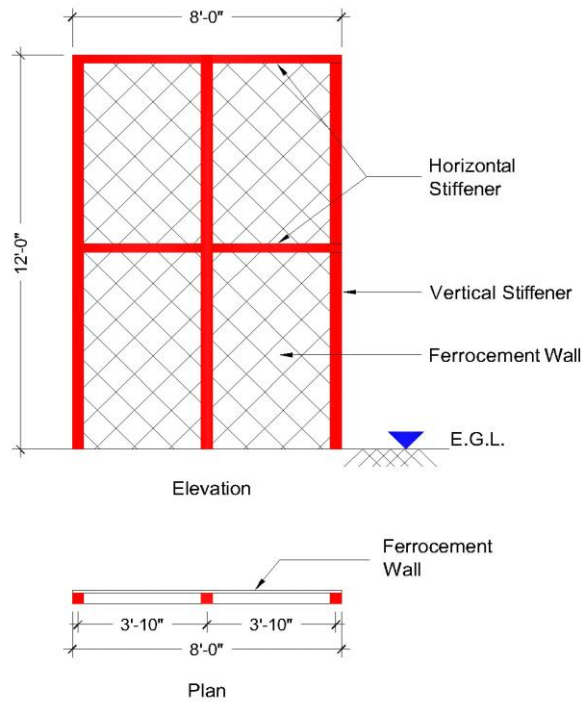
Plan and Elevation of a typical ferrocement non-structural element
